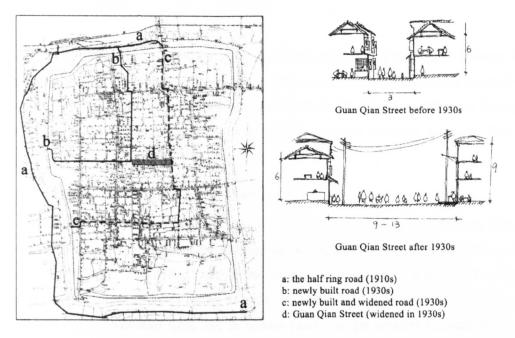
Renewed roads and sections of Guan Qian Street (by the author)
